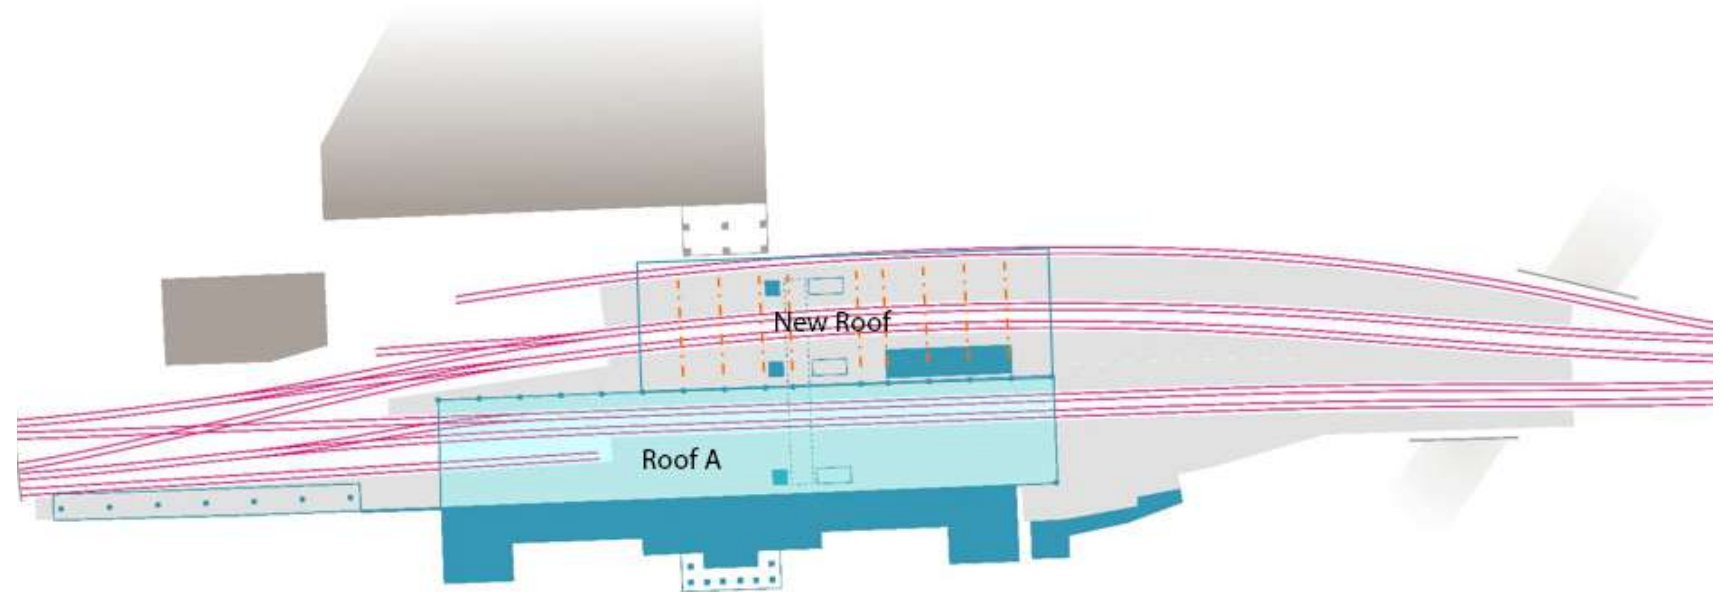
New roof / canopy columns aligned with those of Roof A
